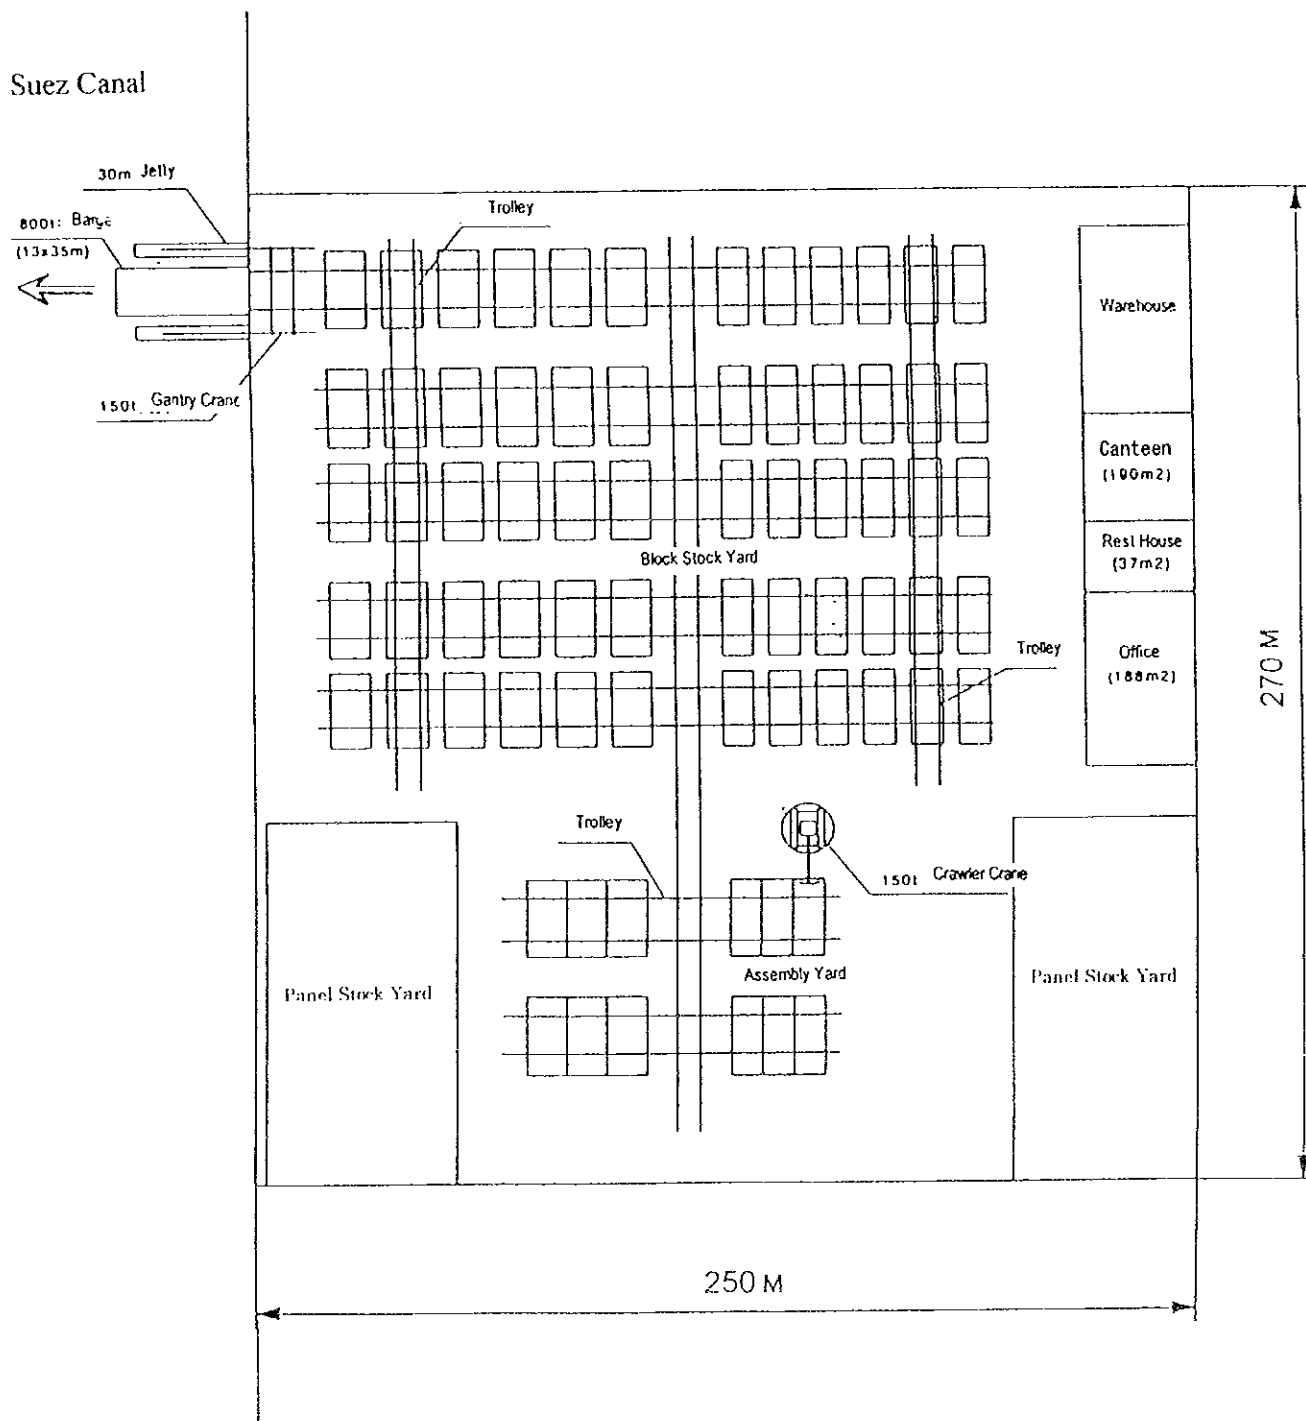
Steel Girder Assembly Yard (East Bank)
